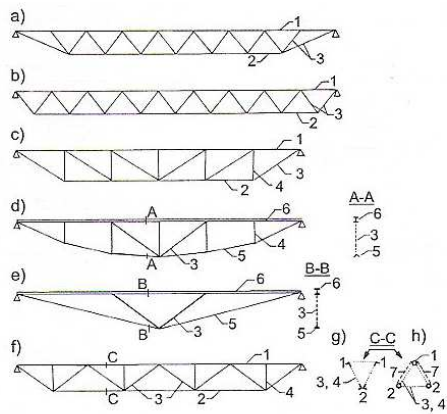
Examples of truss purlins: 1- upper chord, 2- bottom chord, 3- diagonal, 4- vertical, 5- tie, 6- beam, 7- glazing
